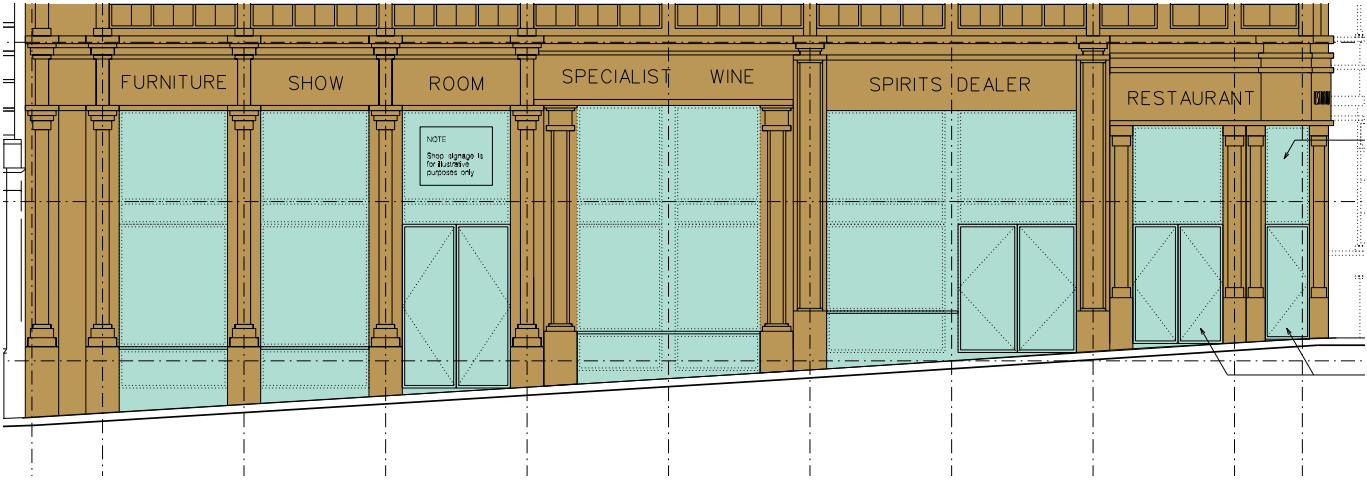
North elevation showing ground and first floor areas of exposed glazing and areas of glazing with perforated mesh in front.
